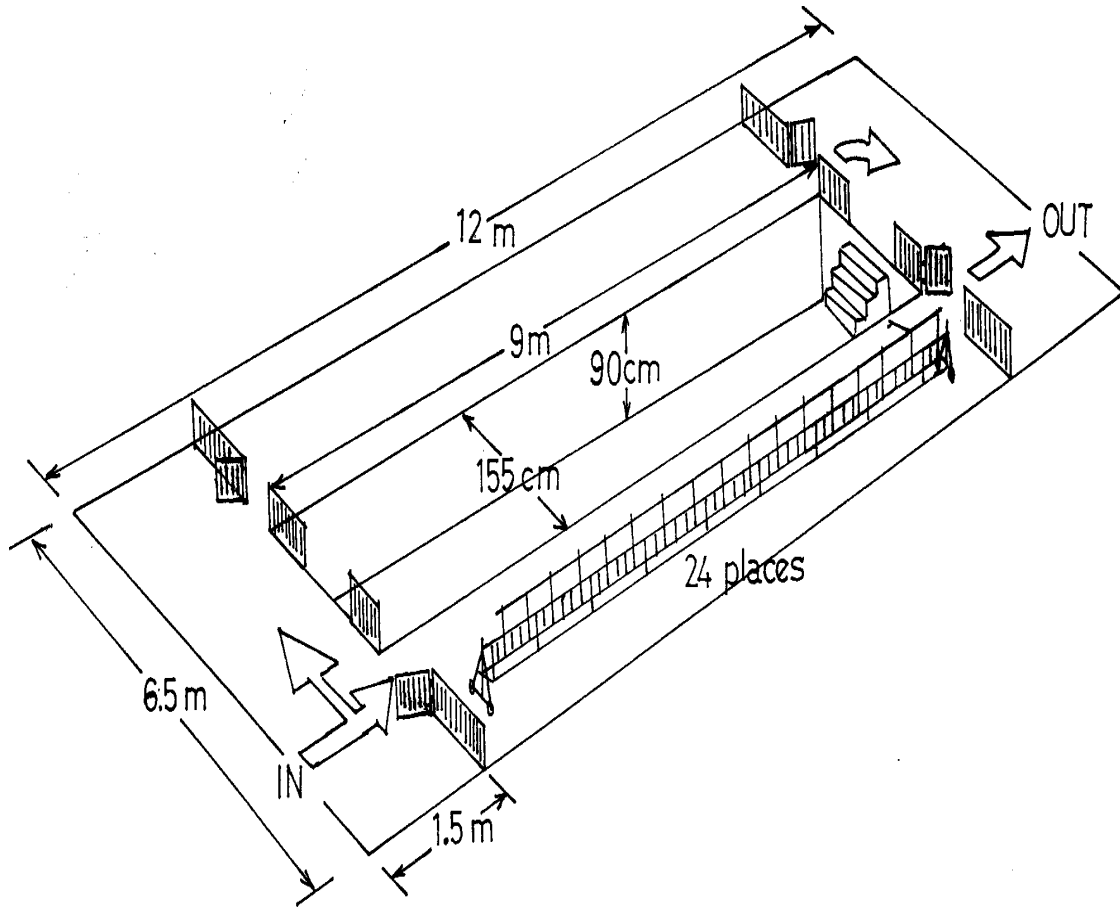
Milking parlour. Layout of the pit system. The pit is 90cm deep.
